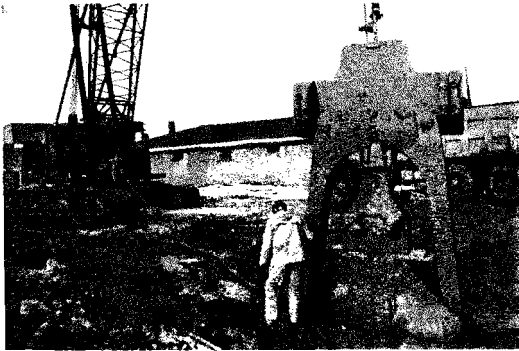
Typical Slurry Wall Clamshell Bucket
